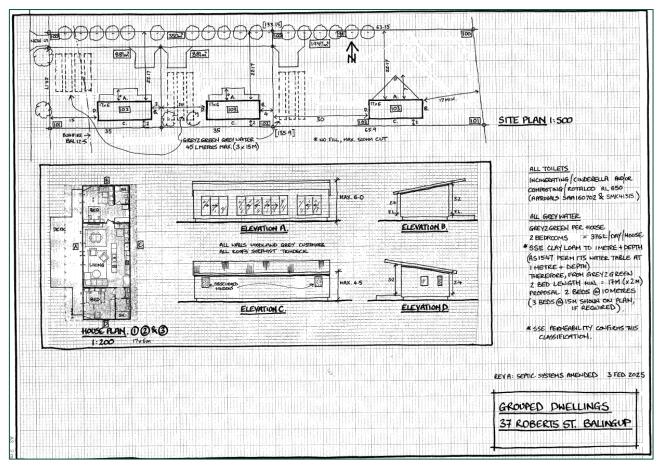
37 Roberts Street Plans dated 3 February 2025
